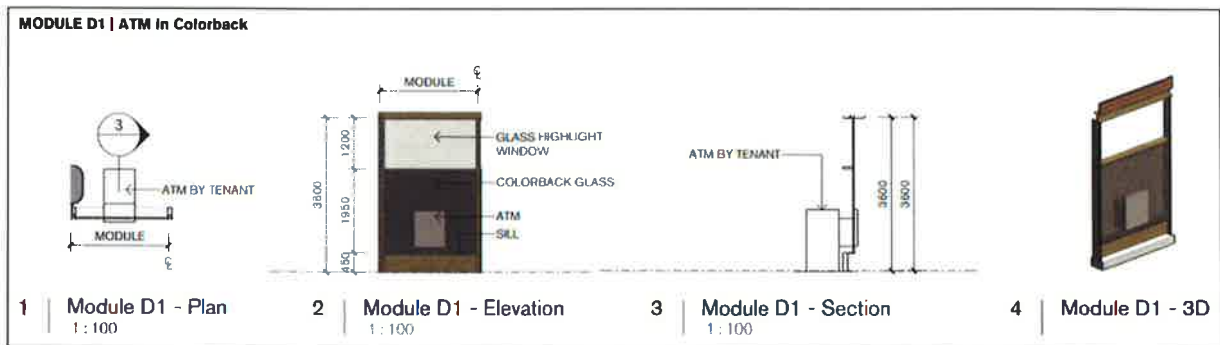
| Proposed new Shopfront Module D1 (Source: Applicant)
